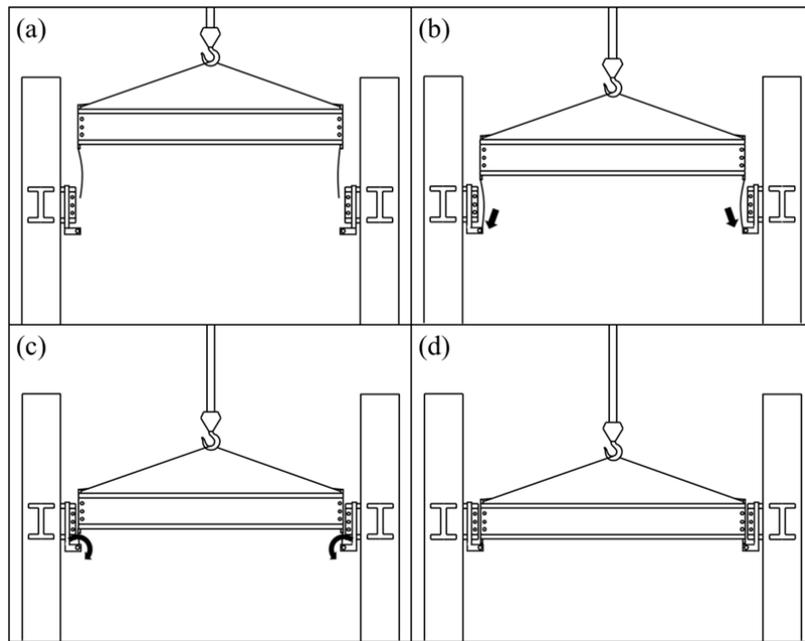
Steel hauling system working process: (a) approaching, (b) catching, (c) rolling, and (d) orientating.
